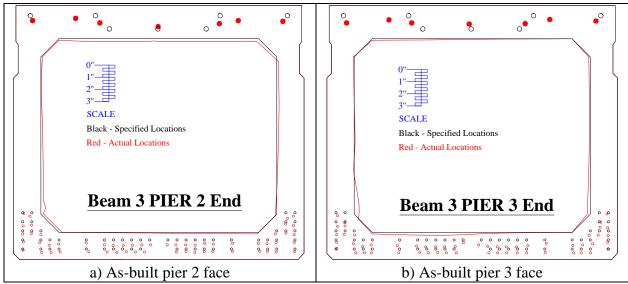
As-Built Section Geometry of Span 3 Beam 3 of Main Street Bridge
